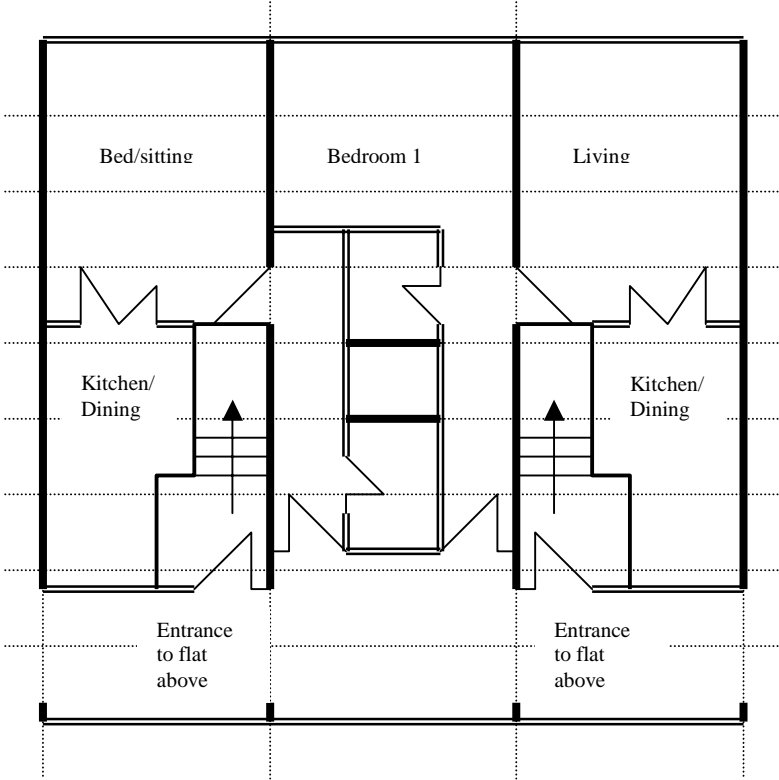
Typical flat layout on access deck level. Left: Bed-sitting room flat. Right: 1 bedroom 2 person flat. (Not to Scale)
